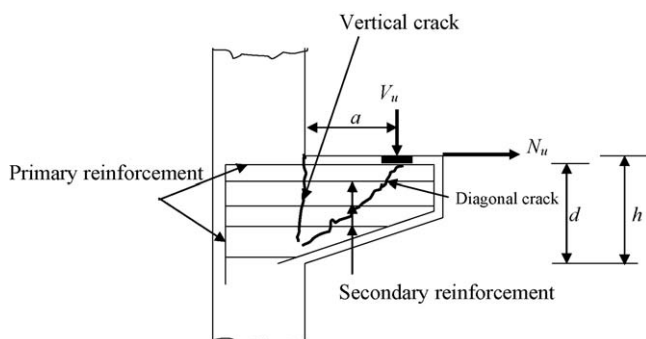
Cracking pattern at shear failure of a typical reinforced concrete corbel.
